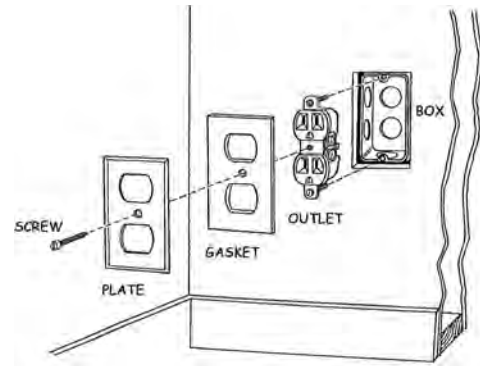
COVER PLATE GASKET INSTALLATION ON AN OUTLET
